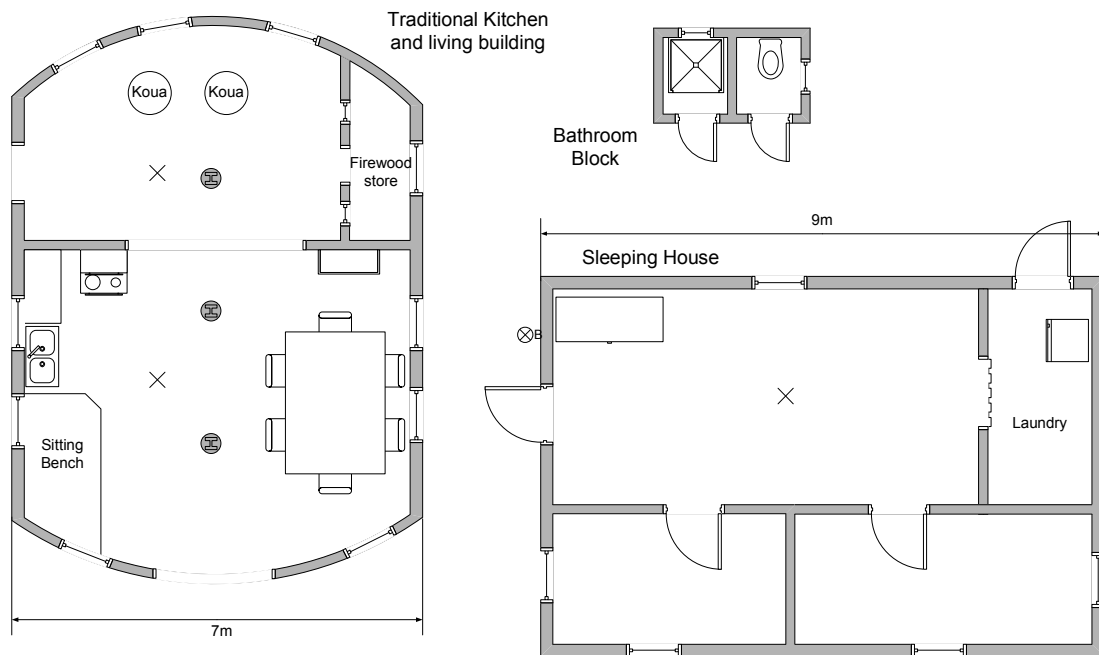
Example for buildings layout of a typical household on Rotuma. Typically, the kitchen building is constructed in (modified) traditional style, with a thatched roof and often corrugated iron walls. The sleeping house is more often made with concrete walls and corrugated iron roofs. Central part of the traditional kitchen is the koua pit, a fireplace for traditional earth cooking.
